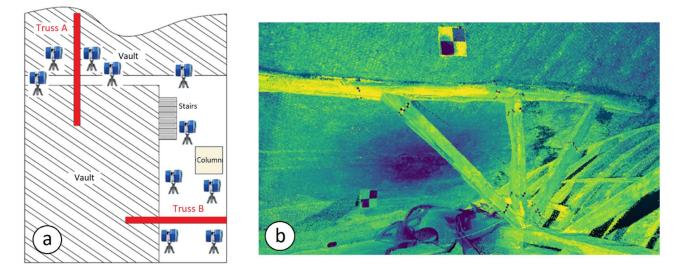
Laser scanner tests: a) scan location; b) truss B view in roof point cloud
